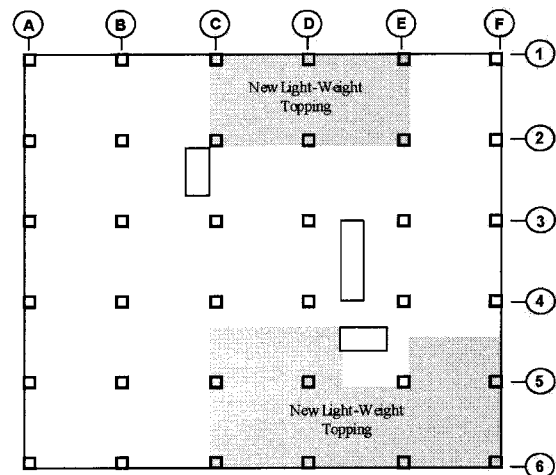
Second Floor Plan Indicating Proposed Areas of Floor Leveling
